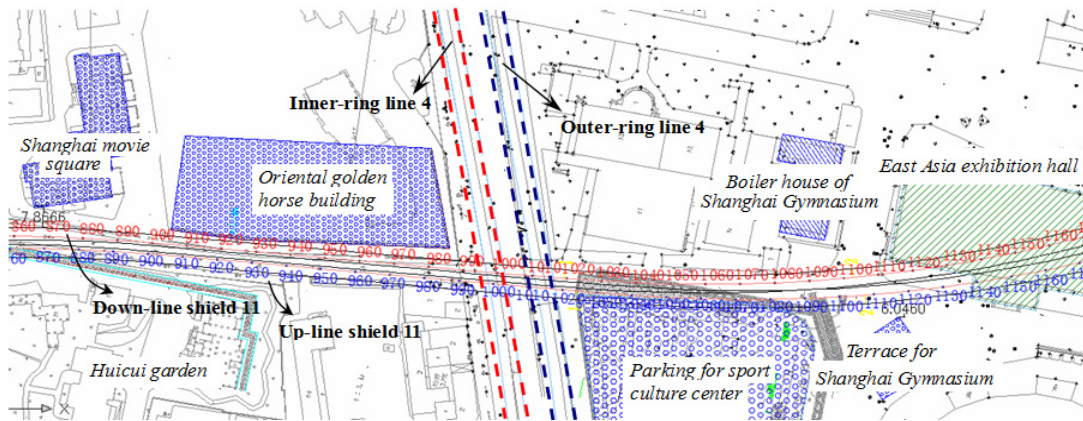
Plan view of second-stage north route of Shanghai railway transportation line 11
